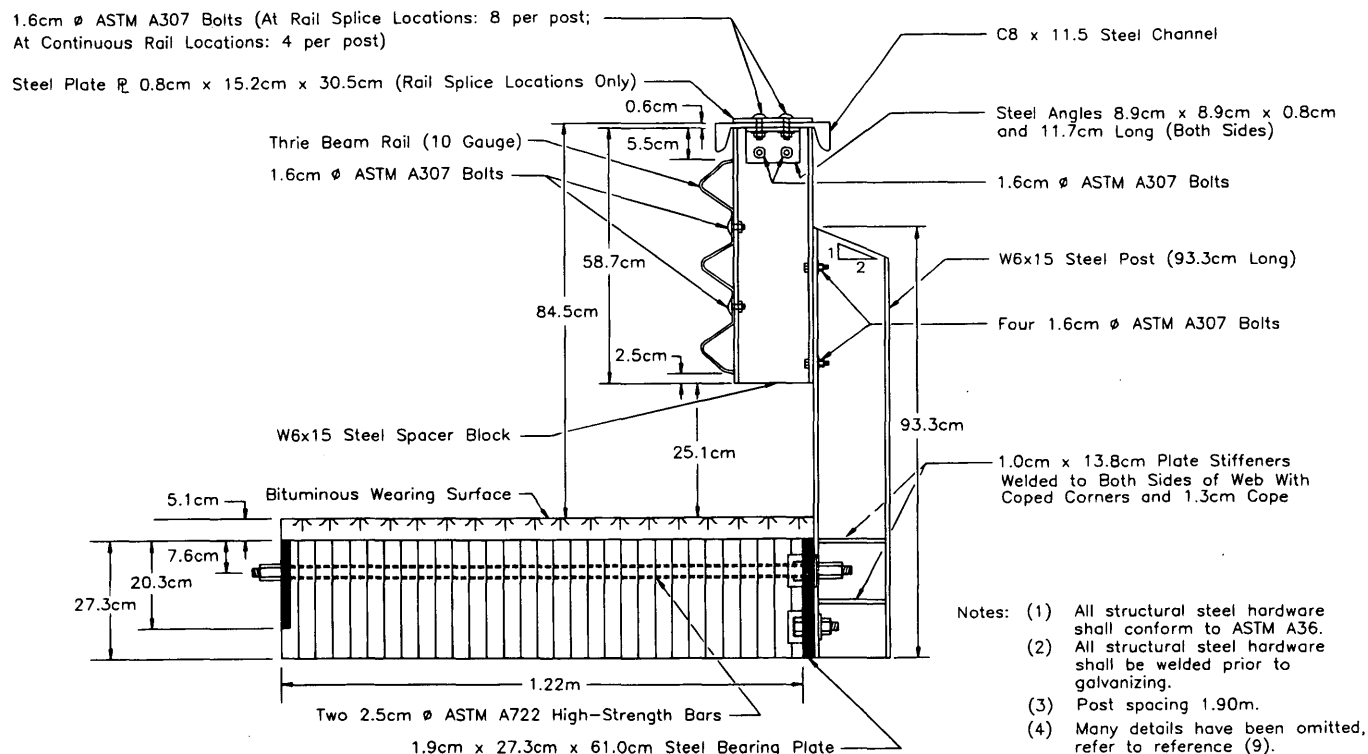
Thrie-beam with channel bridge railing (TBC-8000).
